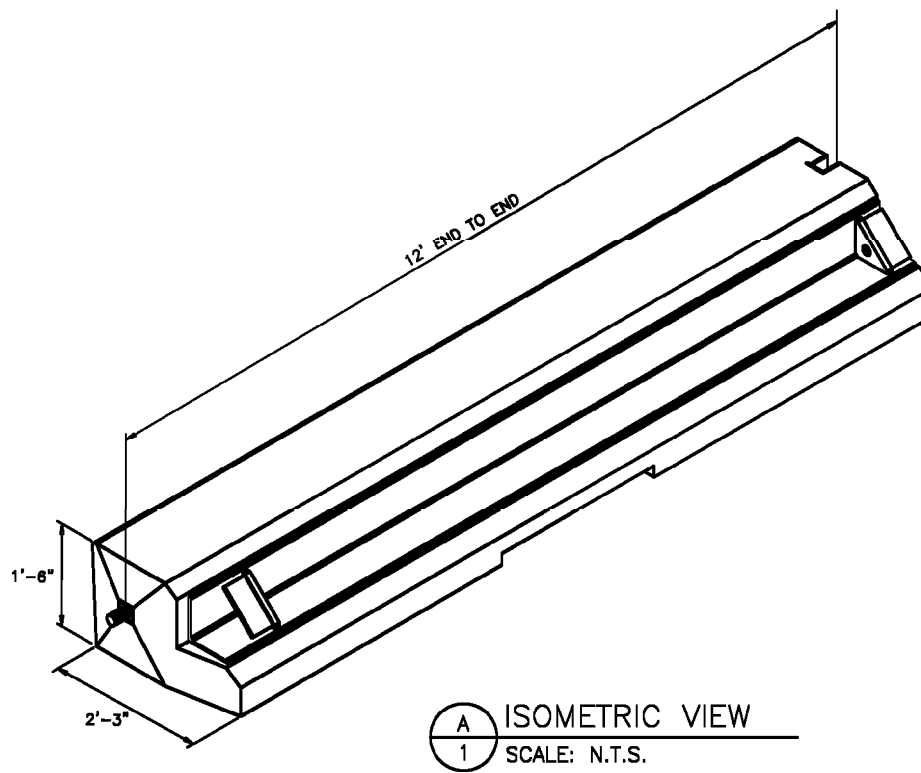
General Details of Portable Concrete Construction Zone Barrier.
